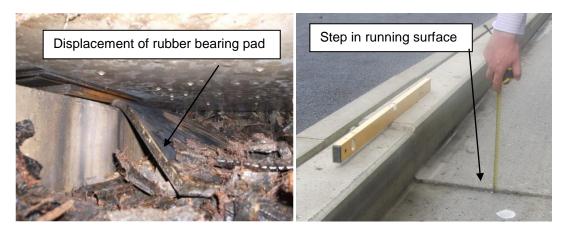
Photographs of displaced rubber bearing pad and a step in the running surface.
